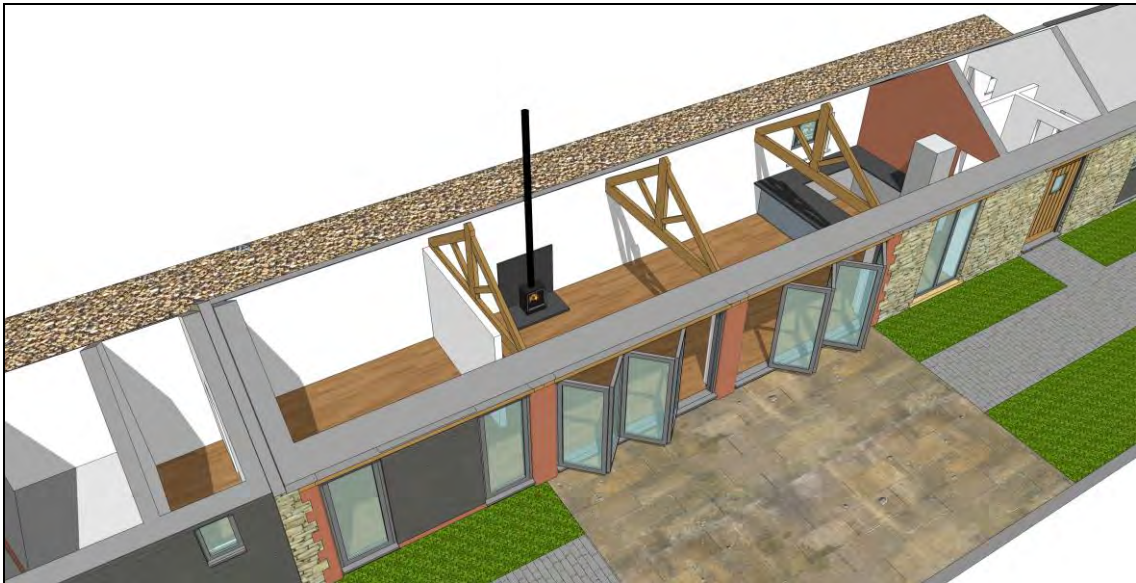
ELEVATED VIEW OF INTERNAL LAYOUT
